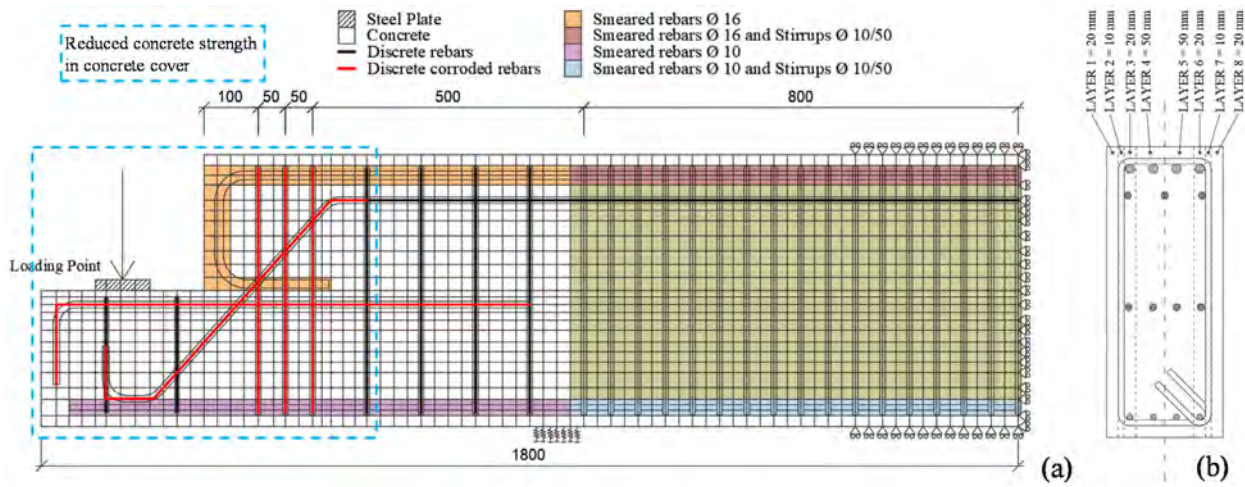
(a) Finite element mesh of the dapped-end beam. (b) Position of reinforcements and layers in section. Dimensions in mm.
